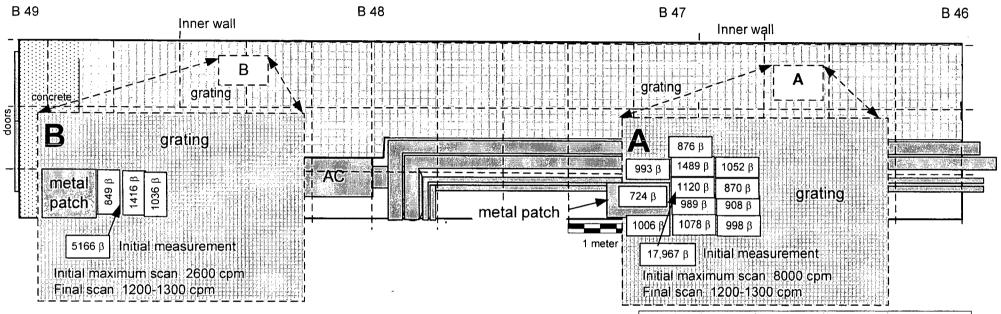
Building 2 Service Corridor Section B Second (Middle) Level Outer Wall Column B 46 to B 49 & End Wall Fixed Exposure Rate and Exposure Rate Scan Measurement Locations and Results
